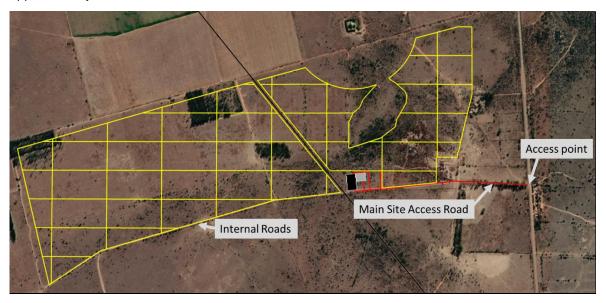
Internal and main access roads for Doornhoek 1 PV.
